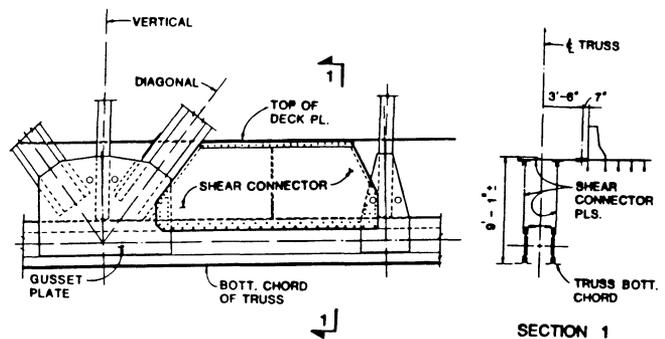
Ben Franklin. Shear connectors between new deck and stiffening trusses in suspended spans
